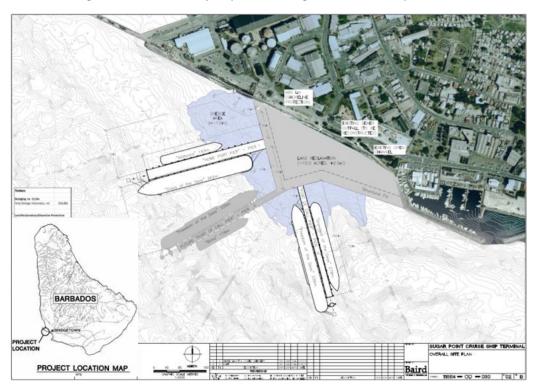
Location and layout plan of the Sugar Point Cruise Ship terminal.
